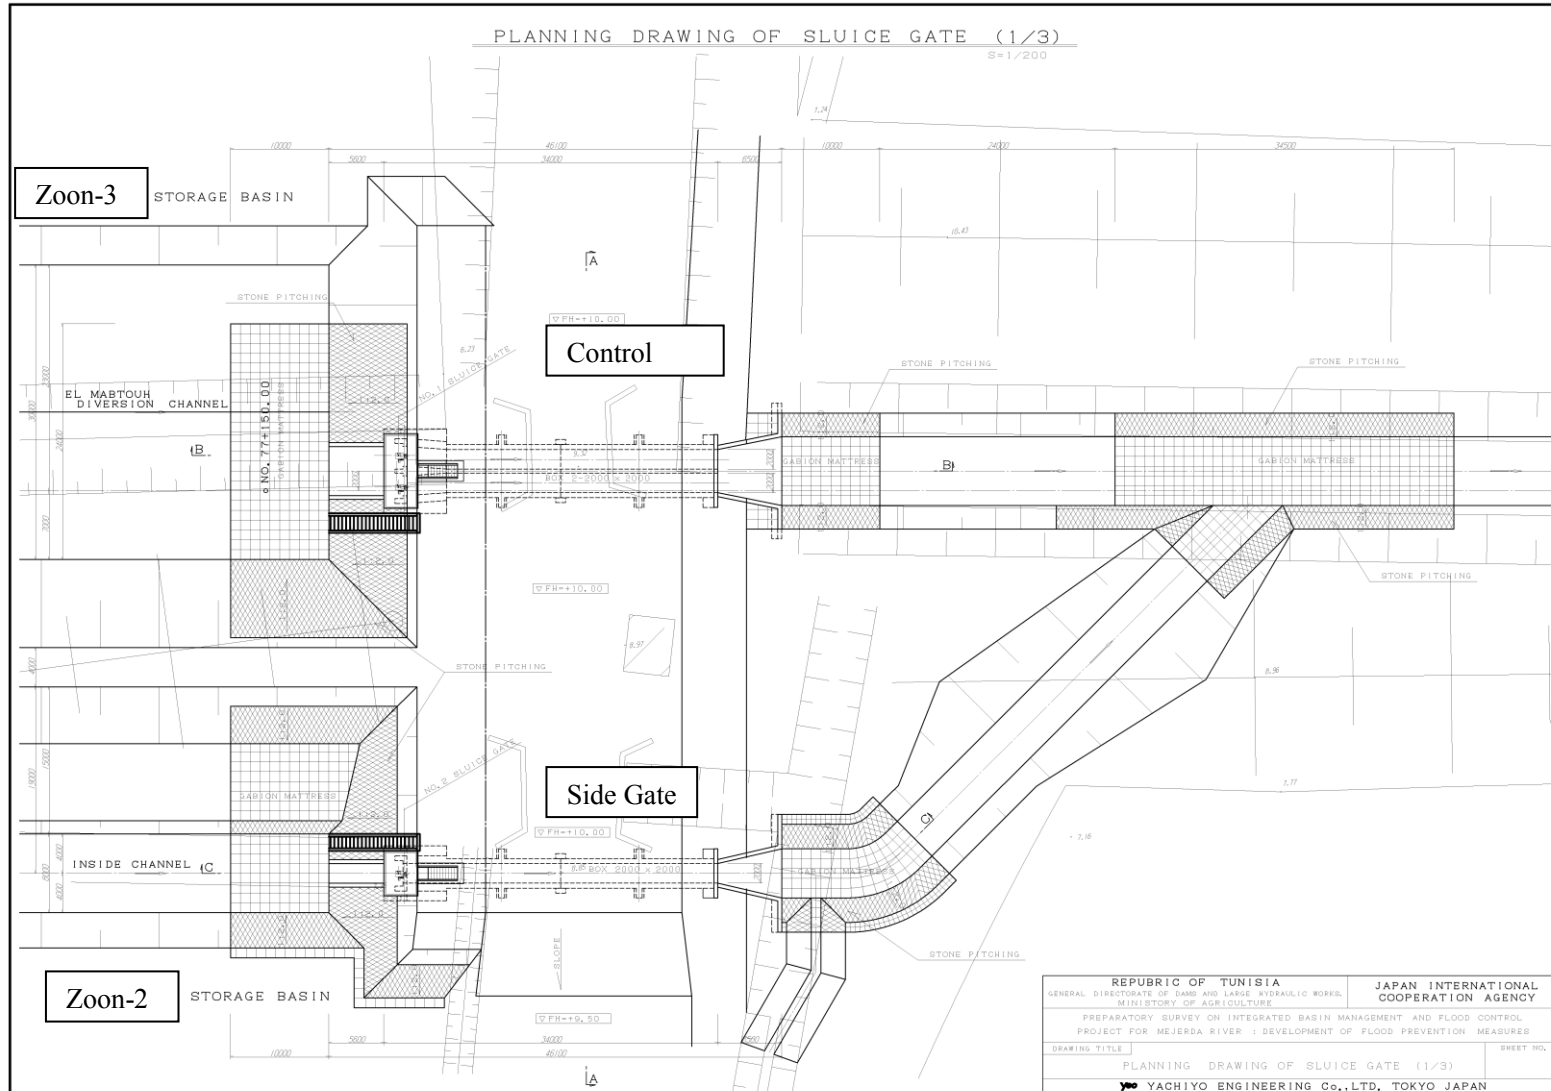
Typical Drawing of Flow Control Facilities (1) Plans
